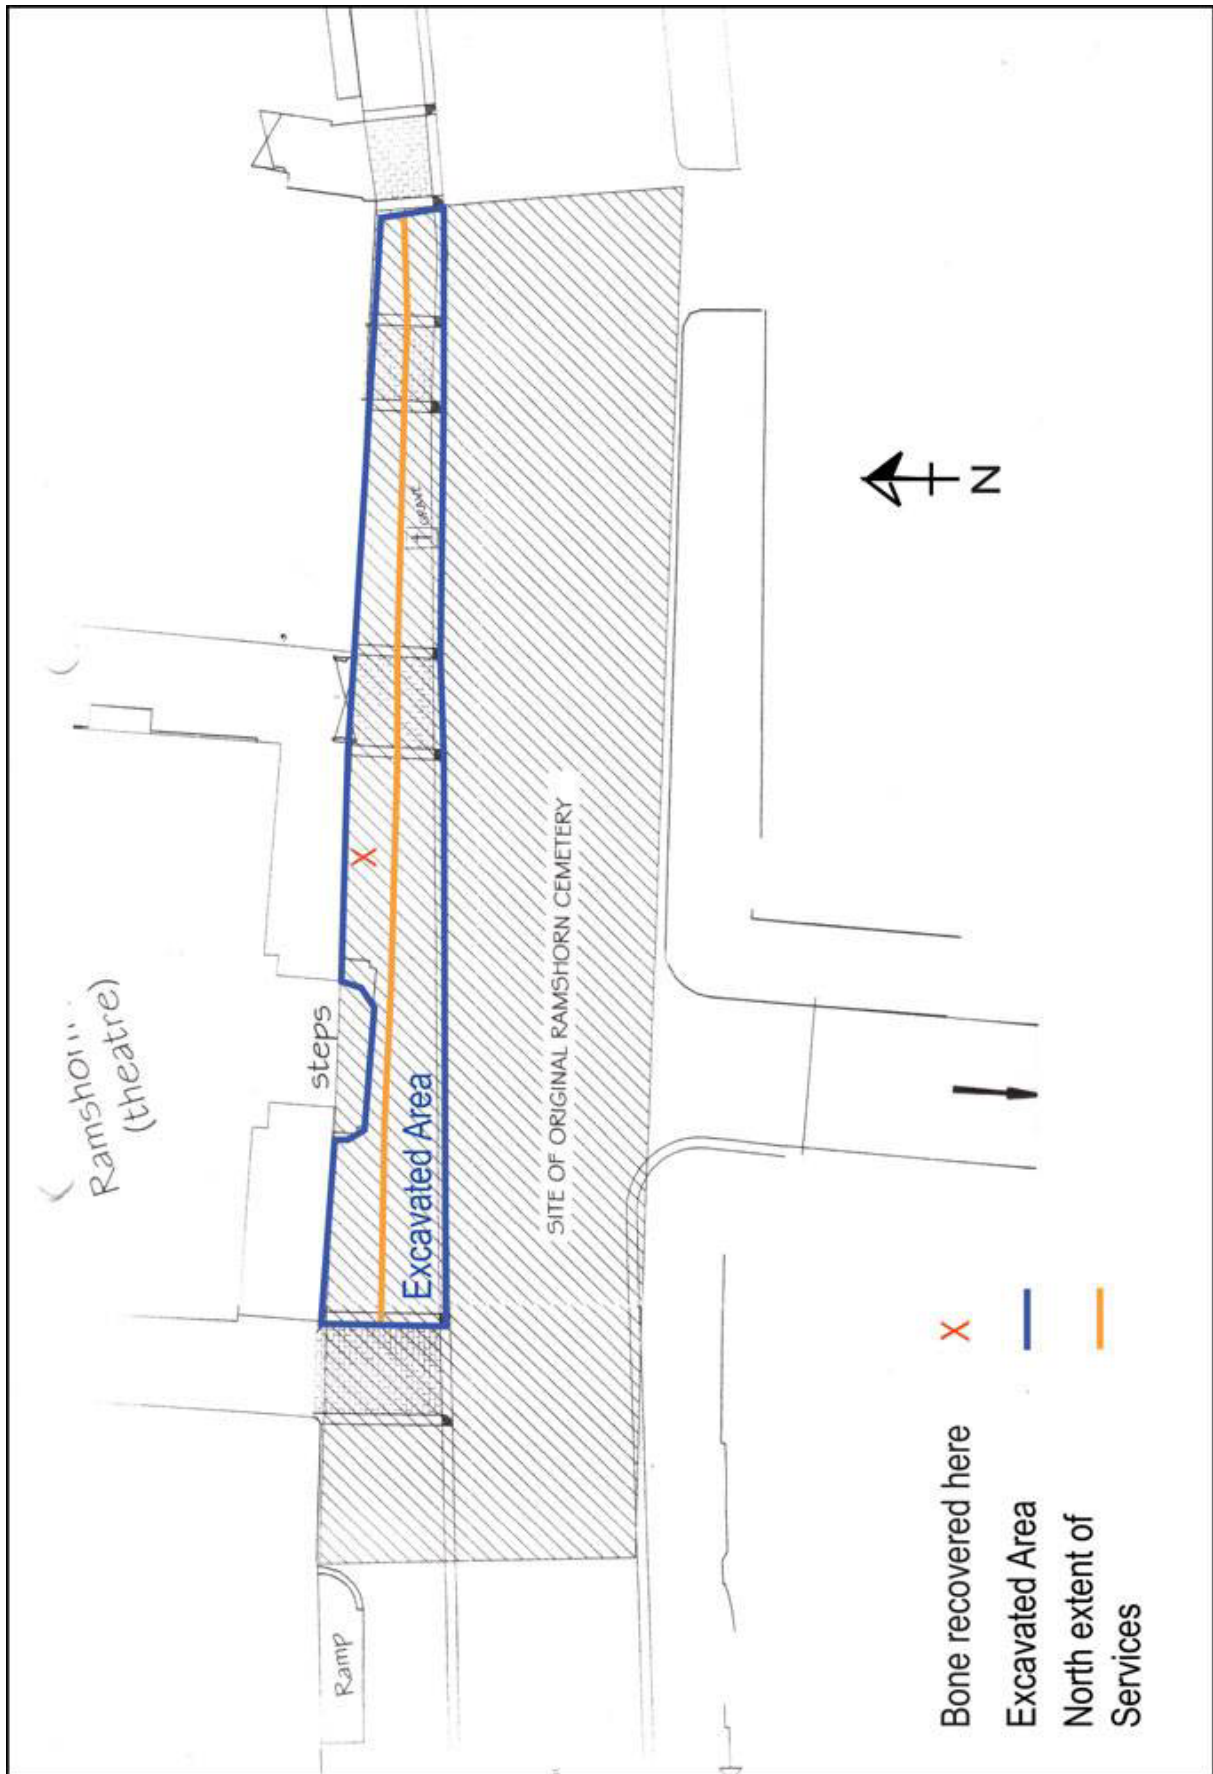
Excavated Area in front of Ramshorn Kirk, Ingram Street, Scale 1:250.
